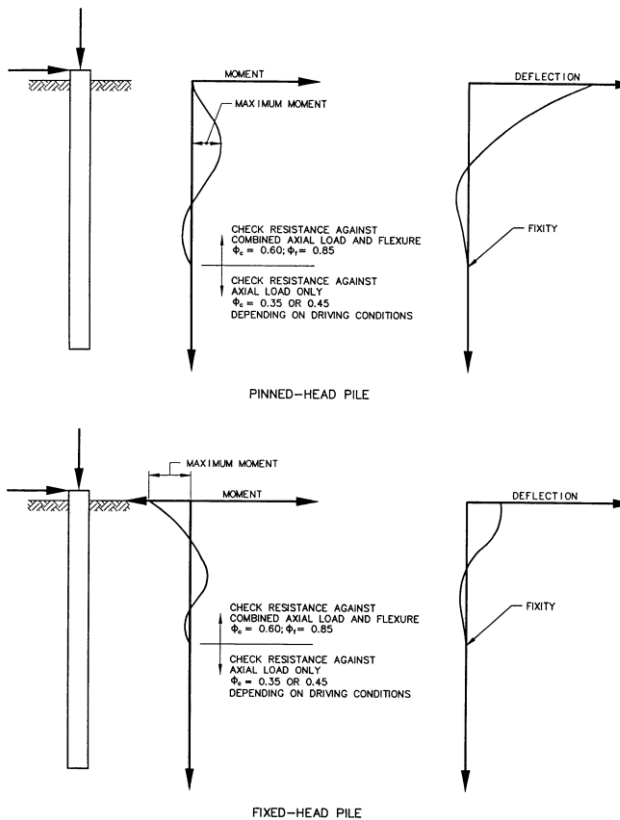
Distribution of Moment and Deflection in Vertical Piles Subjected to Lateral Load
